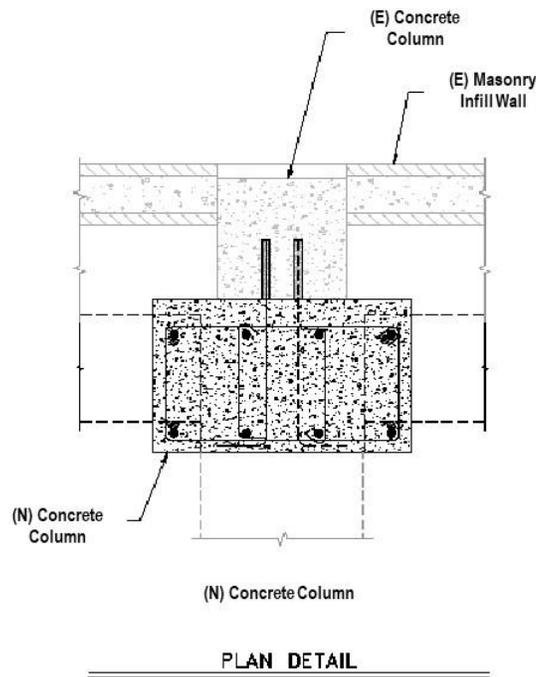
Add new ductile concrete column adjacent to existing nonductile concrete
